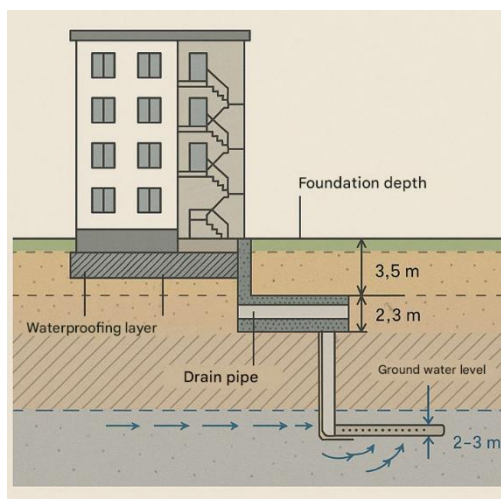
Modern drainage and waterproofing system diagram (1 picture)
